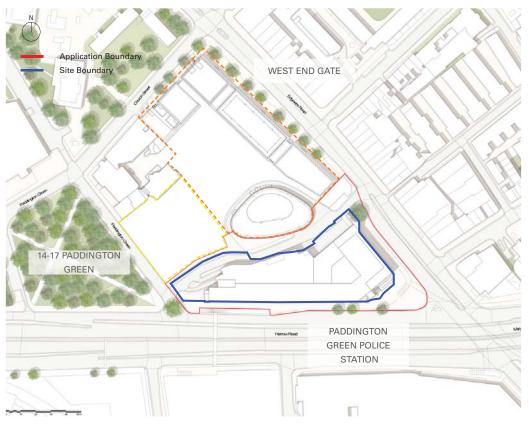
Aerial view of site Fig. 1.4 Location Plan
